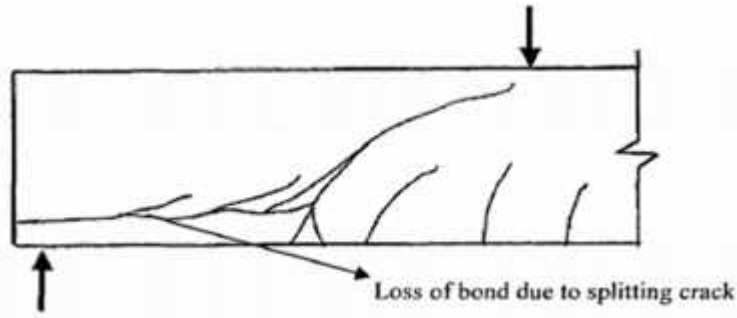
Shear tension failure in short beams (Yalavarthy, 2010)
